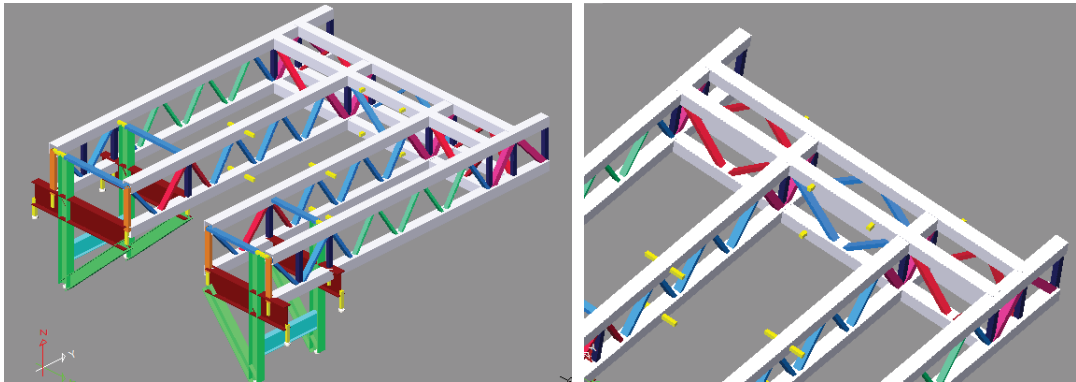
Improved solution - 3D view (left) and connecting beam (right)
